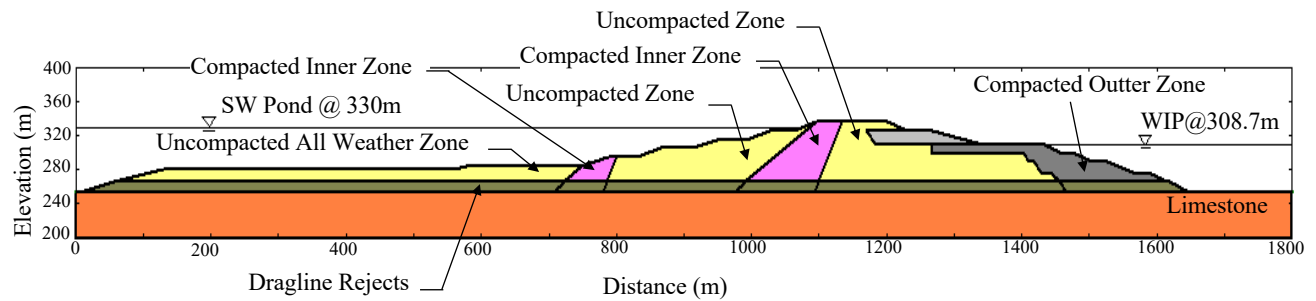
A generic cross-section of Southwest Dam (from Cameron and Fong, 2001)
